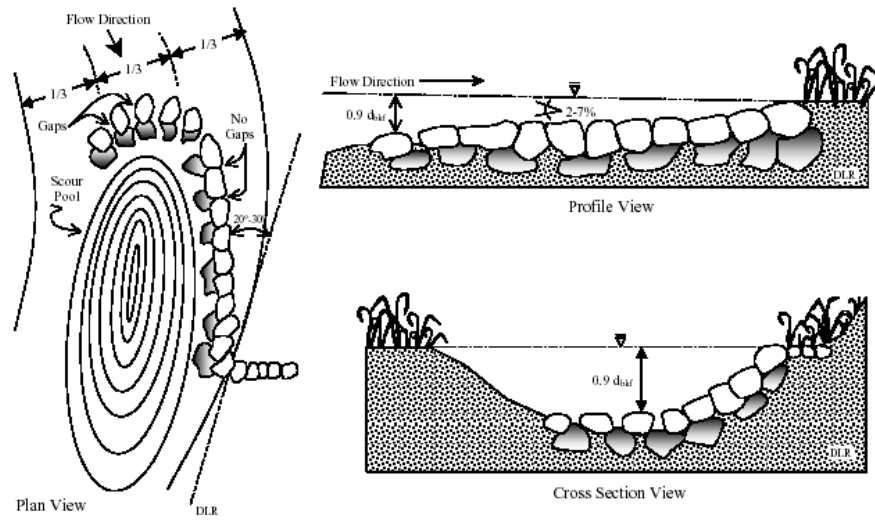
Schematic J-Hook Vane Cross Section, Profile, and Plan View (from Rosgen, 2001b).
